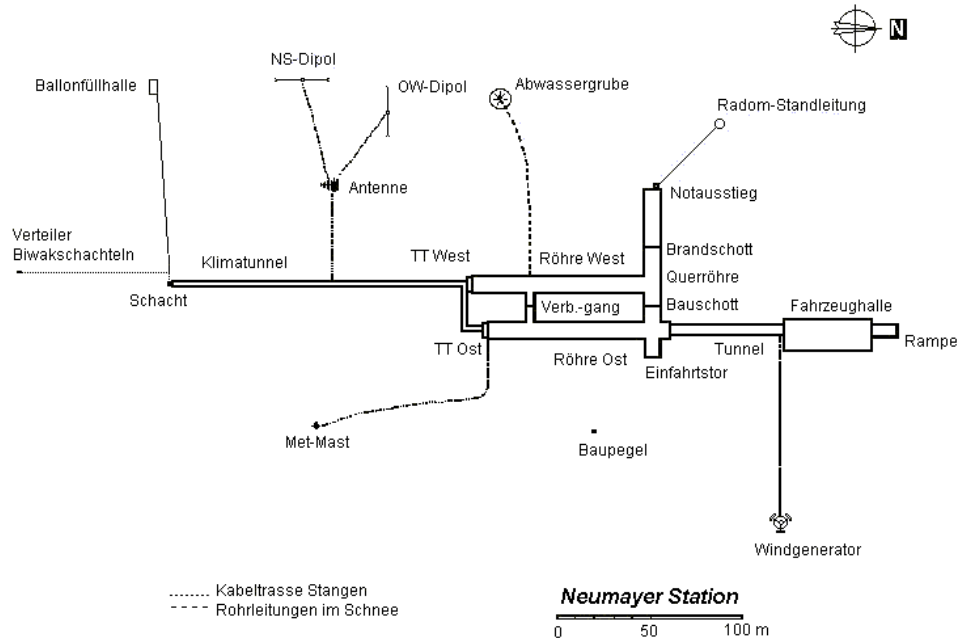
plan view Neumayer Station and outside facilities (source: Polarmar, modified by Saltner & Keij)
